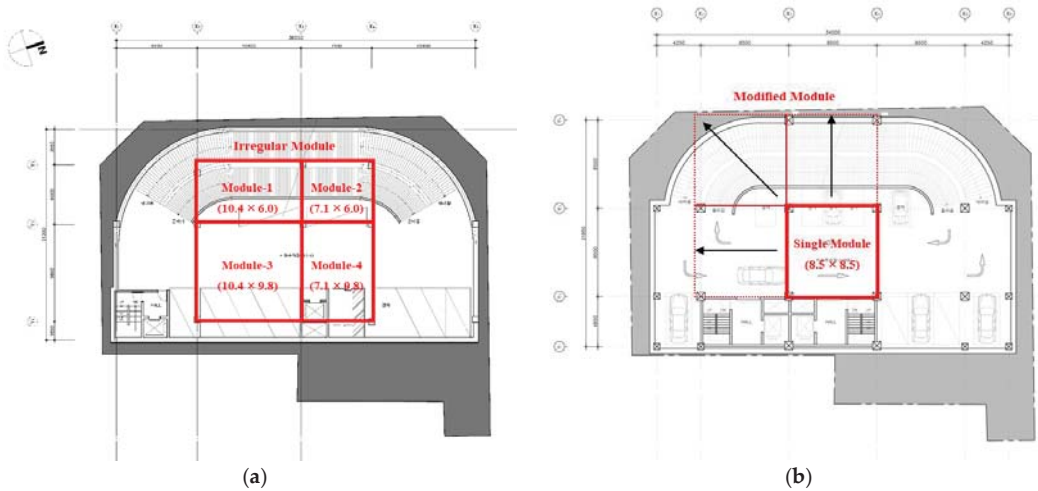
Architectural building design modification: (a) architectural design of basement before modification; (b) modified architectural design of basement.
